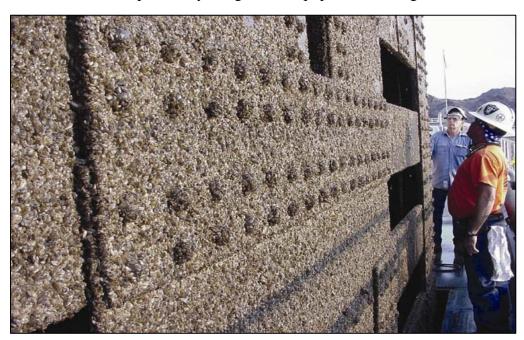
Mussels covering a penstock gate at Davis Dam (photo courtesy of Dave Arend, 2008).
